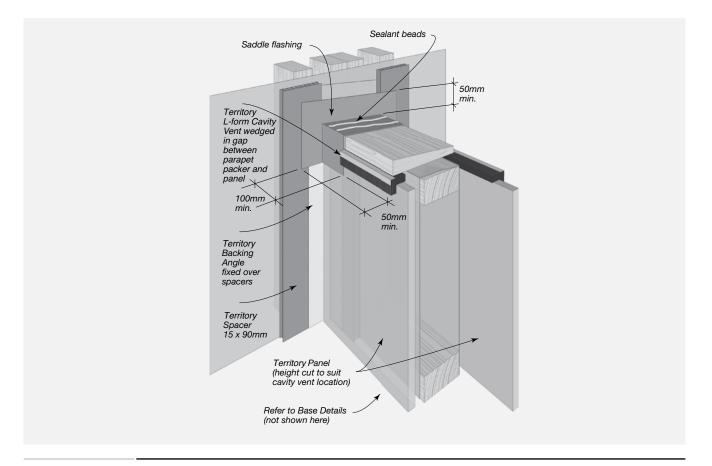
Two Sided Parapet Wall Junction - Stage 1 Procedure
